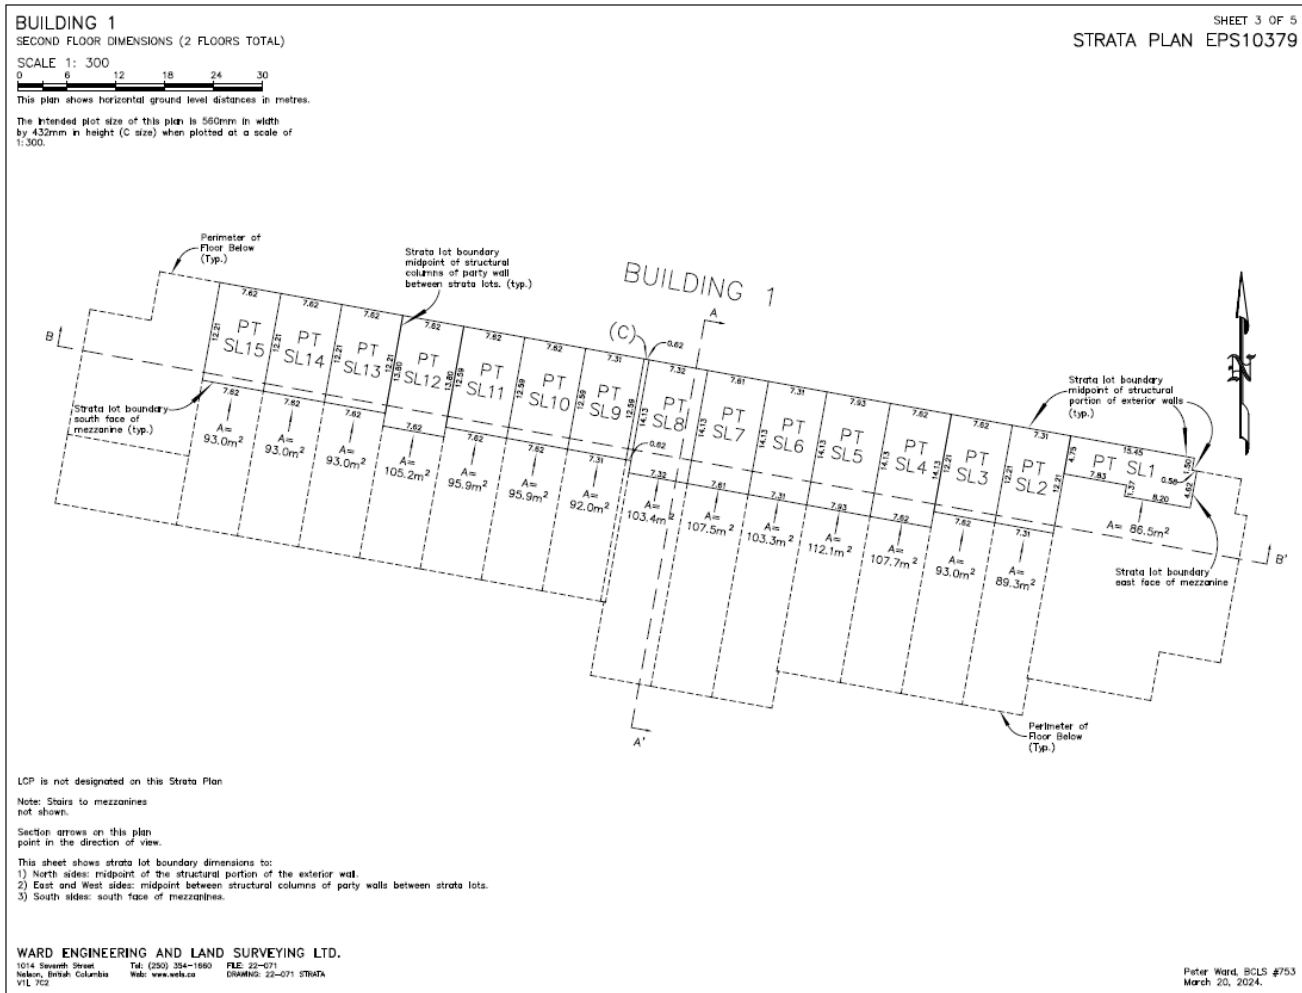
Proposed Strata Plan (second floor mezzanine plan)
